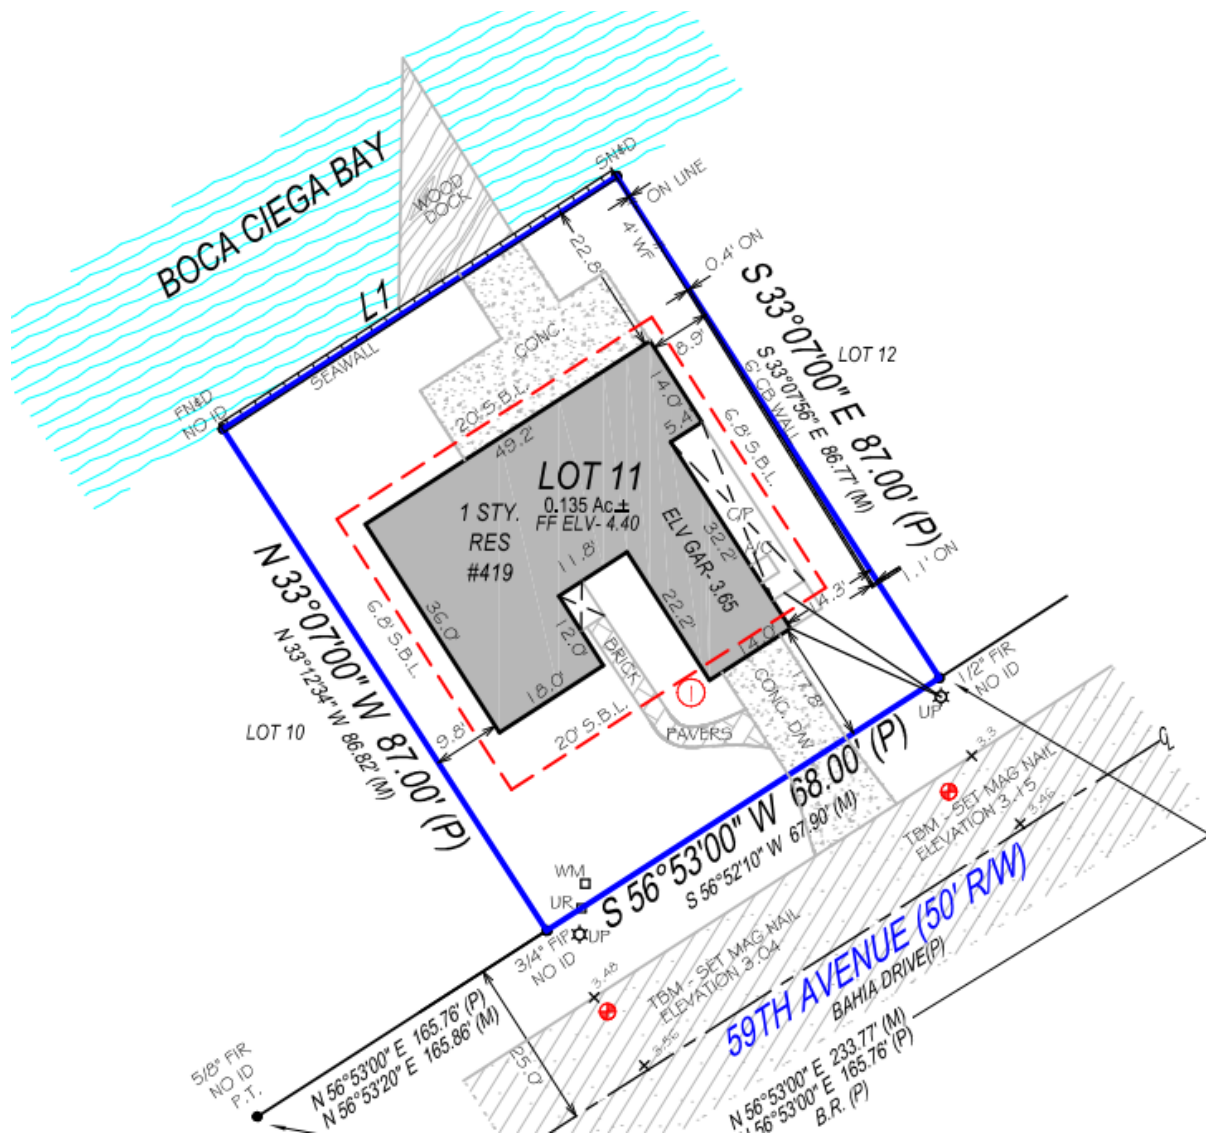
Proposed Site Plan with proposed improvements – subject porch and balcony in red (N.T.S.)
